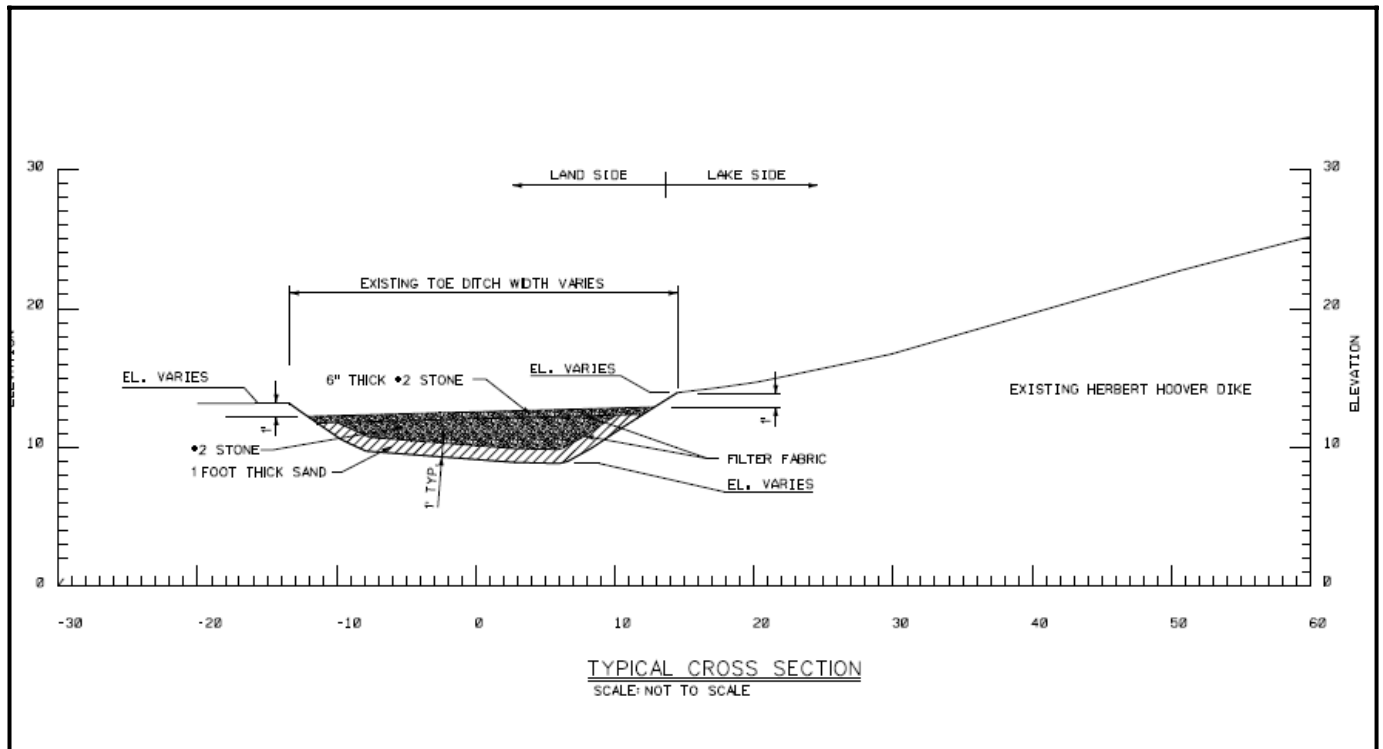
CROSS SECTION OF TYPICAL TOE DITCH BACKFILLING
